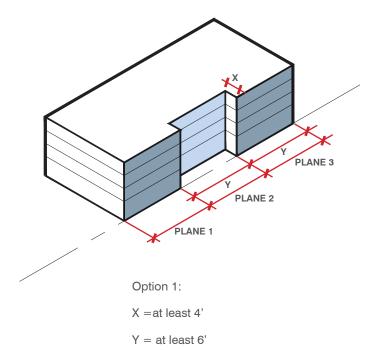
FIGURE: BUILDING MODULATION OPTION 1 DIAGRAM
